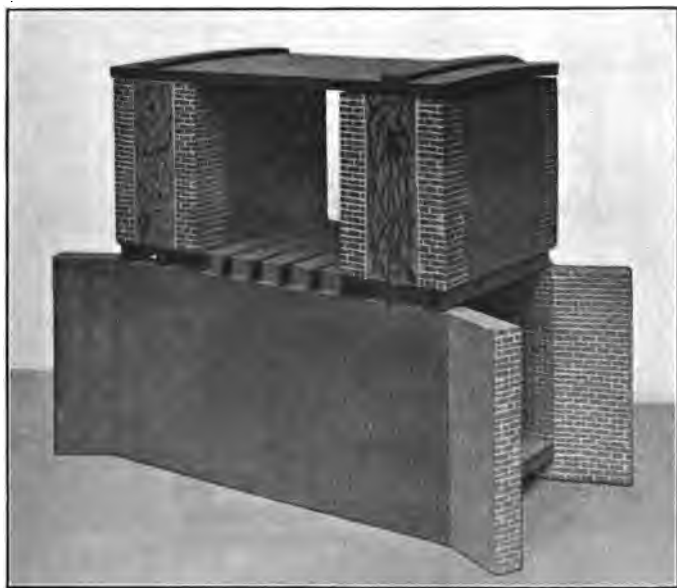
Photograph of model of an air-crossing. Girders are placed across brick walls the space between them being filled in with concrete. Double brick walls are built on the girders and the spaces between them filled in with stone packing.
